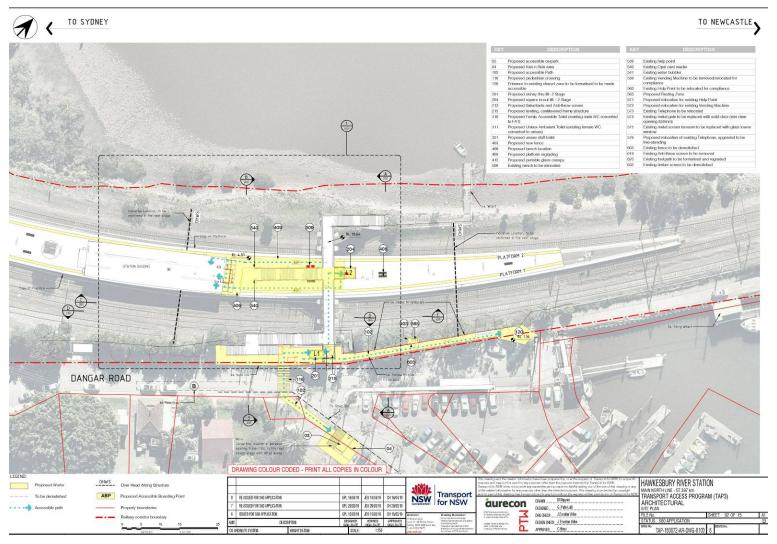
Plan view of Hawkesbury River Station showing areas where works are proposed (yellow).
